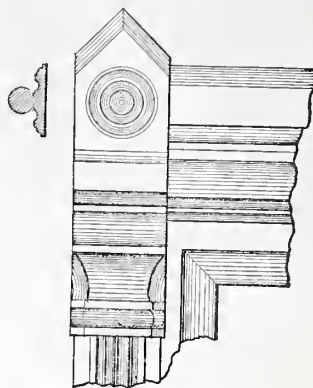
Face View of Corner of Outside Finish and Bracket.
